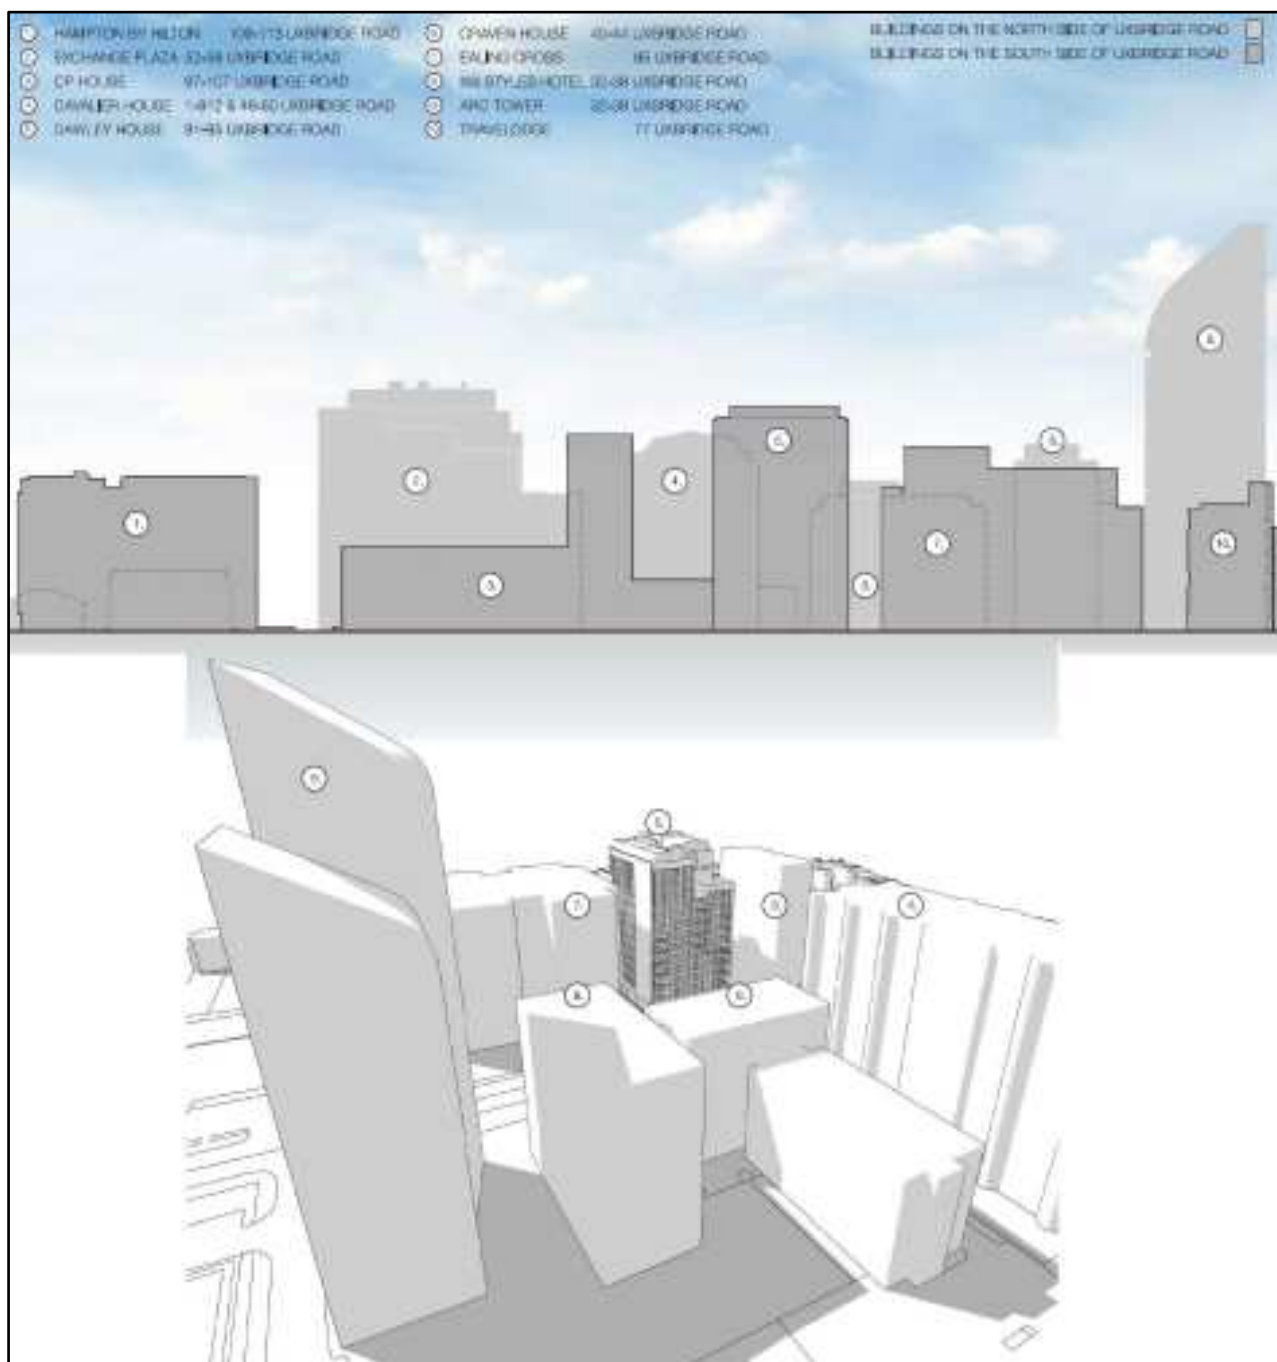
Illustration of the proposed buildings massing within the context of surrounding buildings
